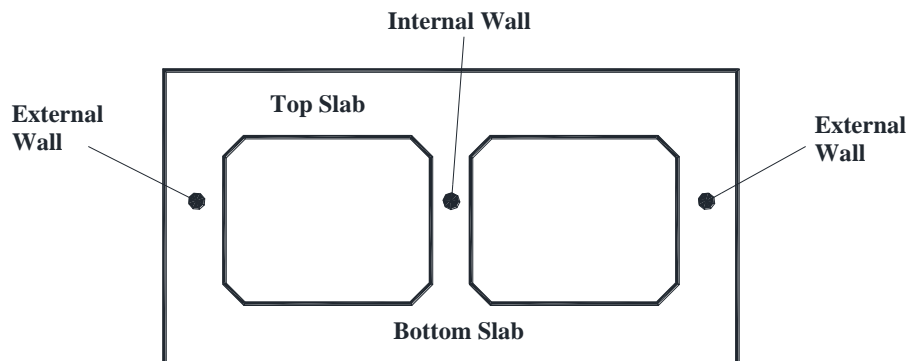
Section, B/B-FLSS WST Connecting Service Tunnel
